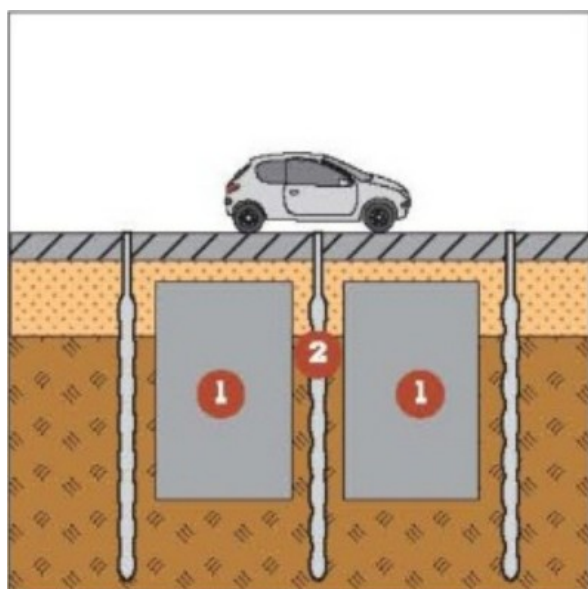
Roadway supported on RIT piles acting as columns and retaining walls. 1: underpass; 2: RIT pile.
